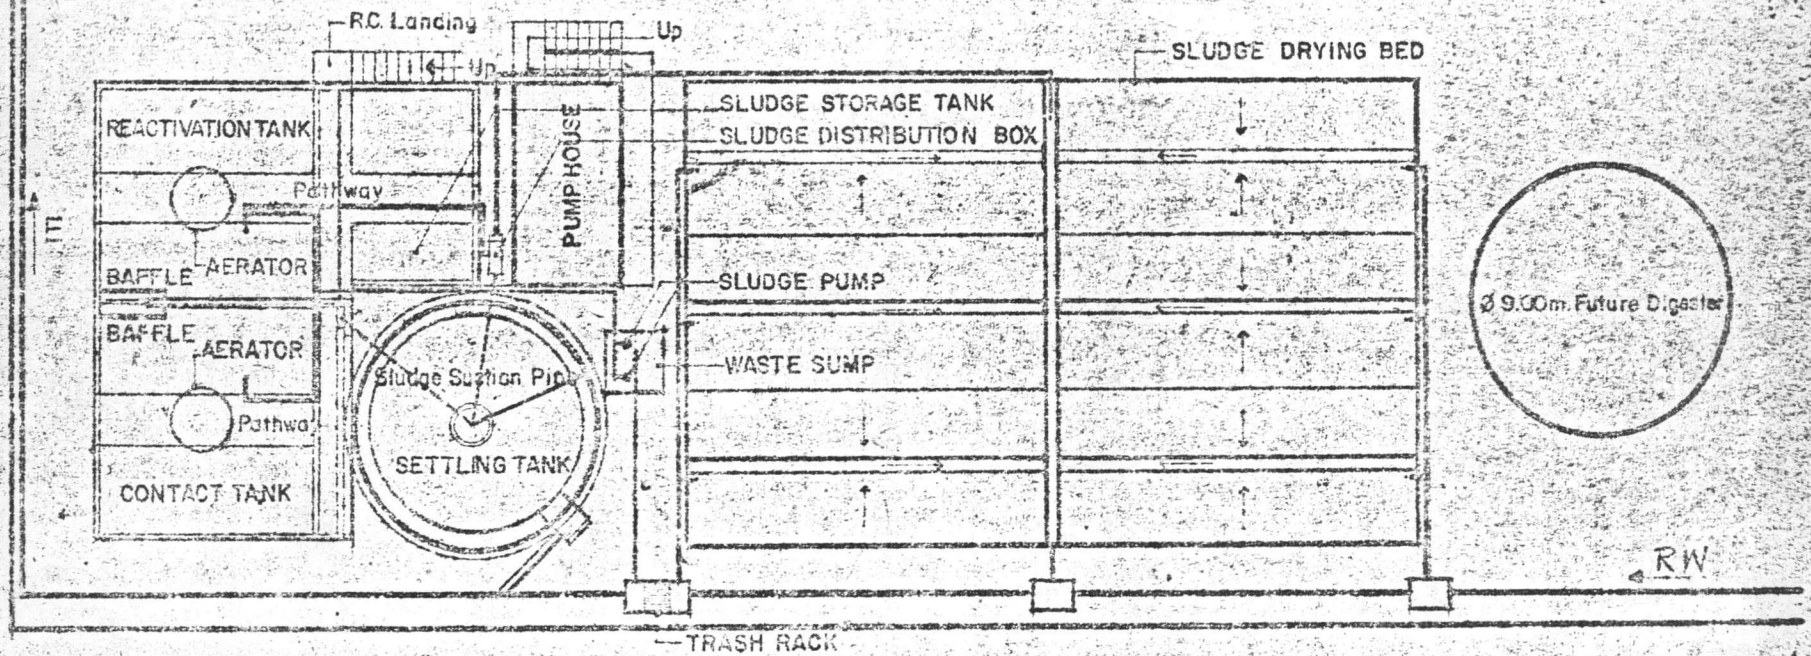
LAYOUT PLAN OF WASTE TREATMENT PLANT
